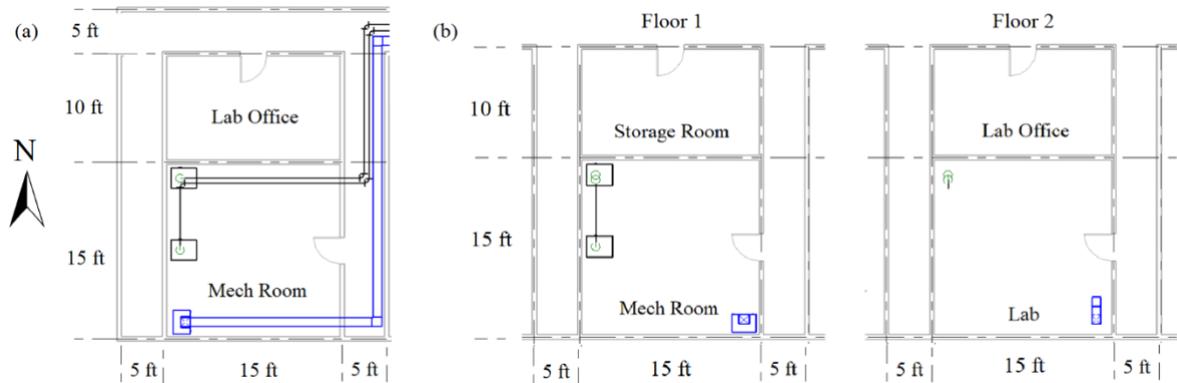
Scenario plans: (a) Scenario A plan; (b) Scenario B plans for floors 1 and 2.
